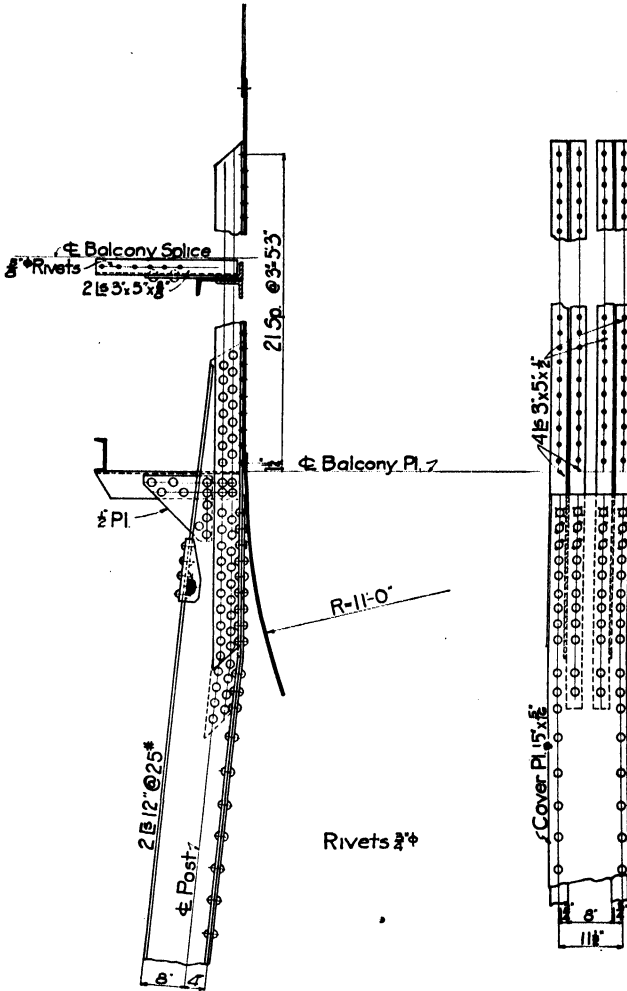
Post to tank connection for 100,000-gal. tank.
